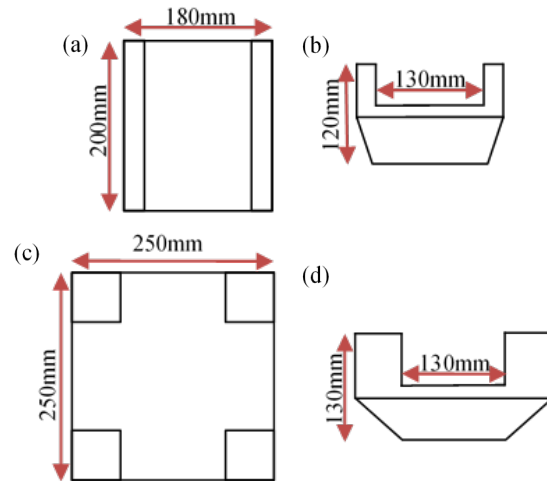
(a)Top plan of Dou A (b)Elevation of Dou A (c)Top plan of Dou B (d)Elevation of Dou B
